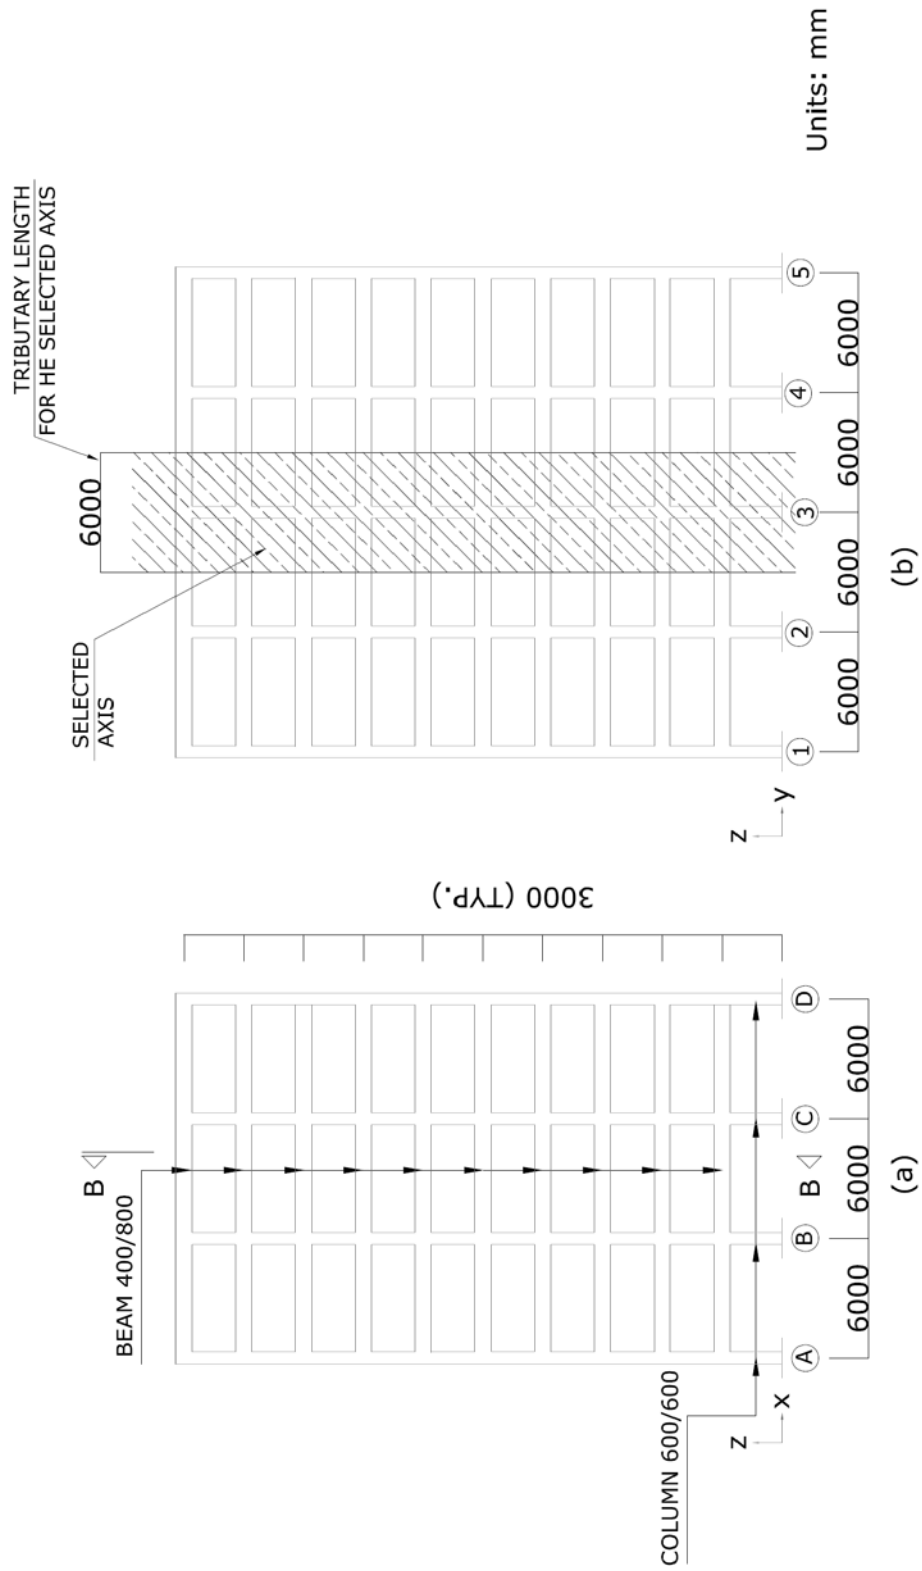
(a) Analyzed frame of the ten-storey building (b) B-B section view
